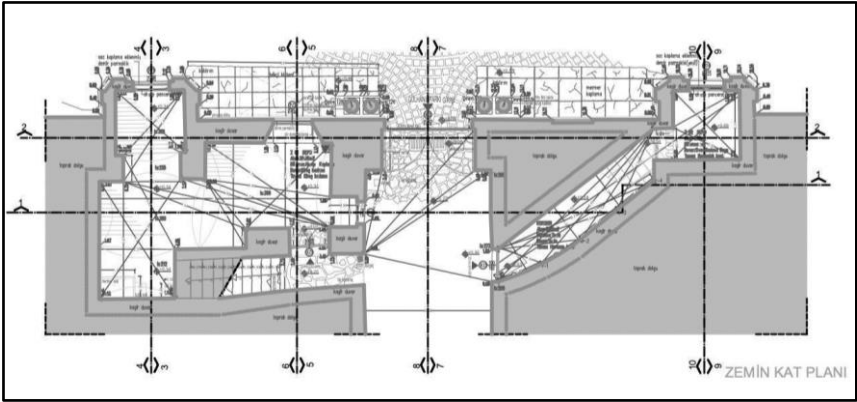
Mecidiye Gate Survey – Ground Floor (Author Archive, Bimtaş, 2009)
